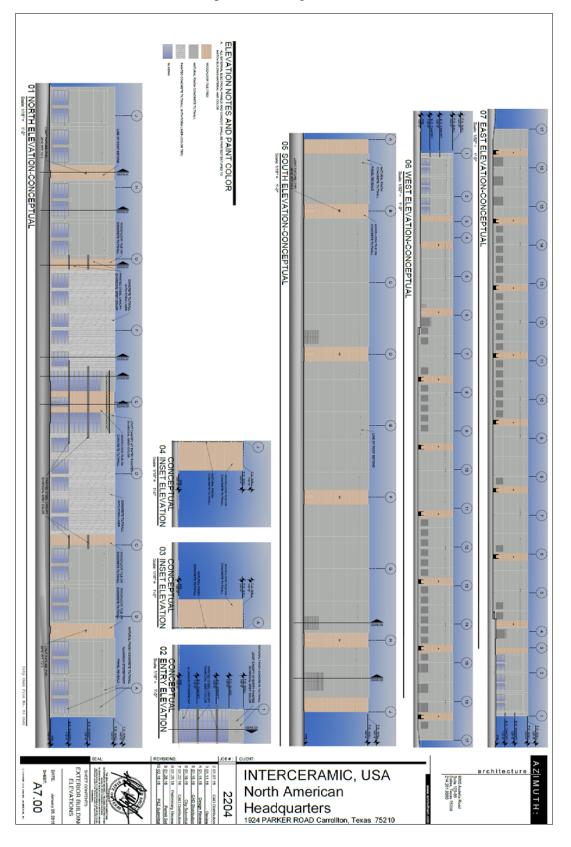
# EXHIBIT CSheet 3 of 10 Conceptual Building Elevations
